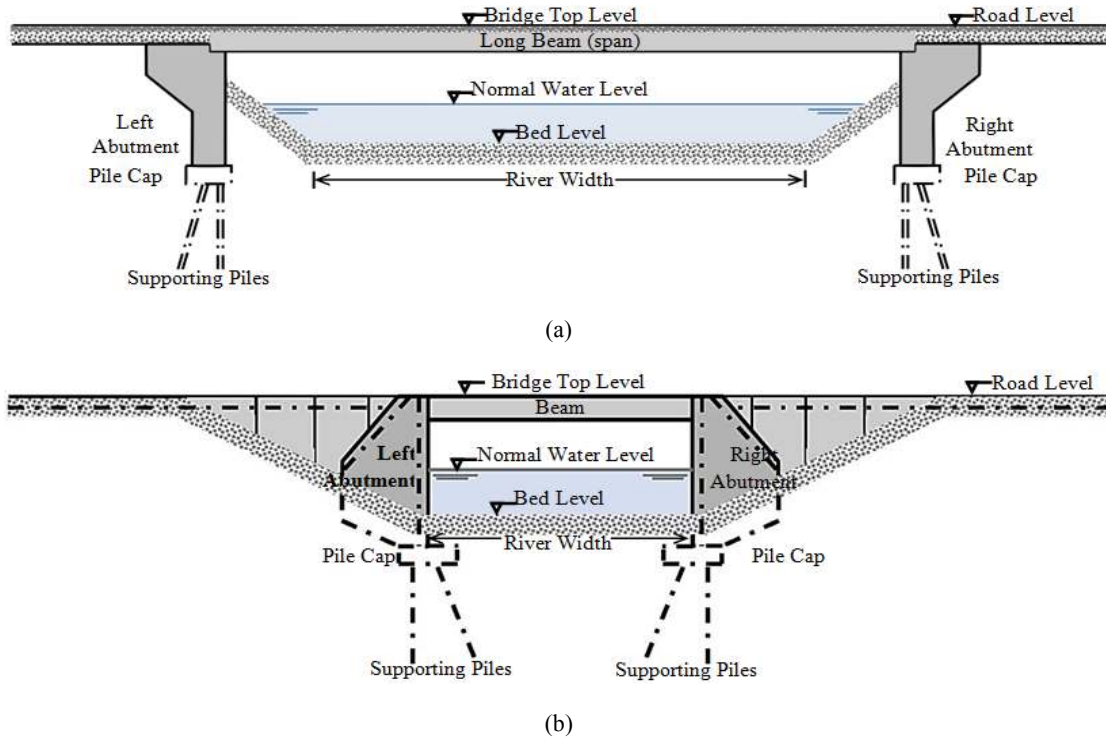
(a) A simple beam bridge, (b) an abutment bridge main structures
